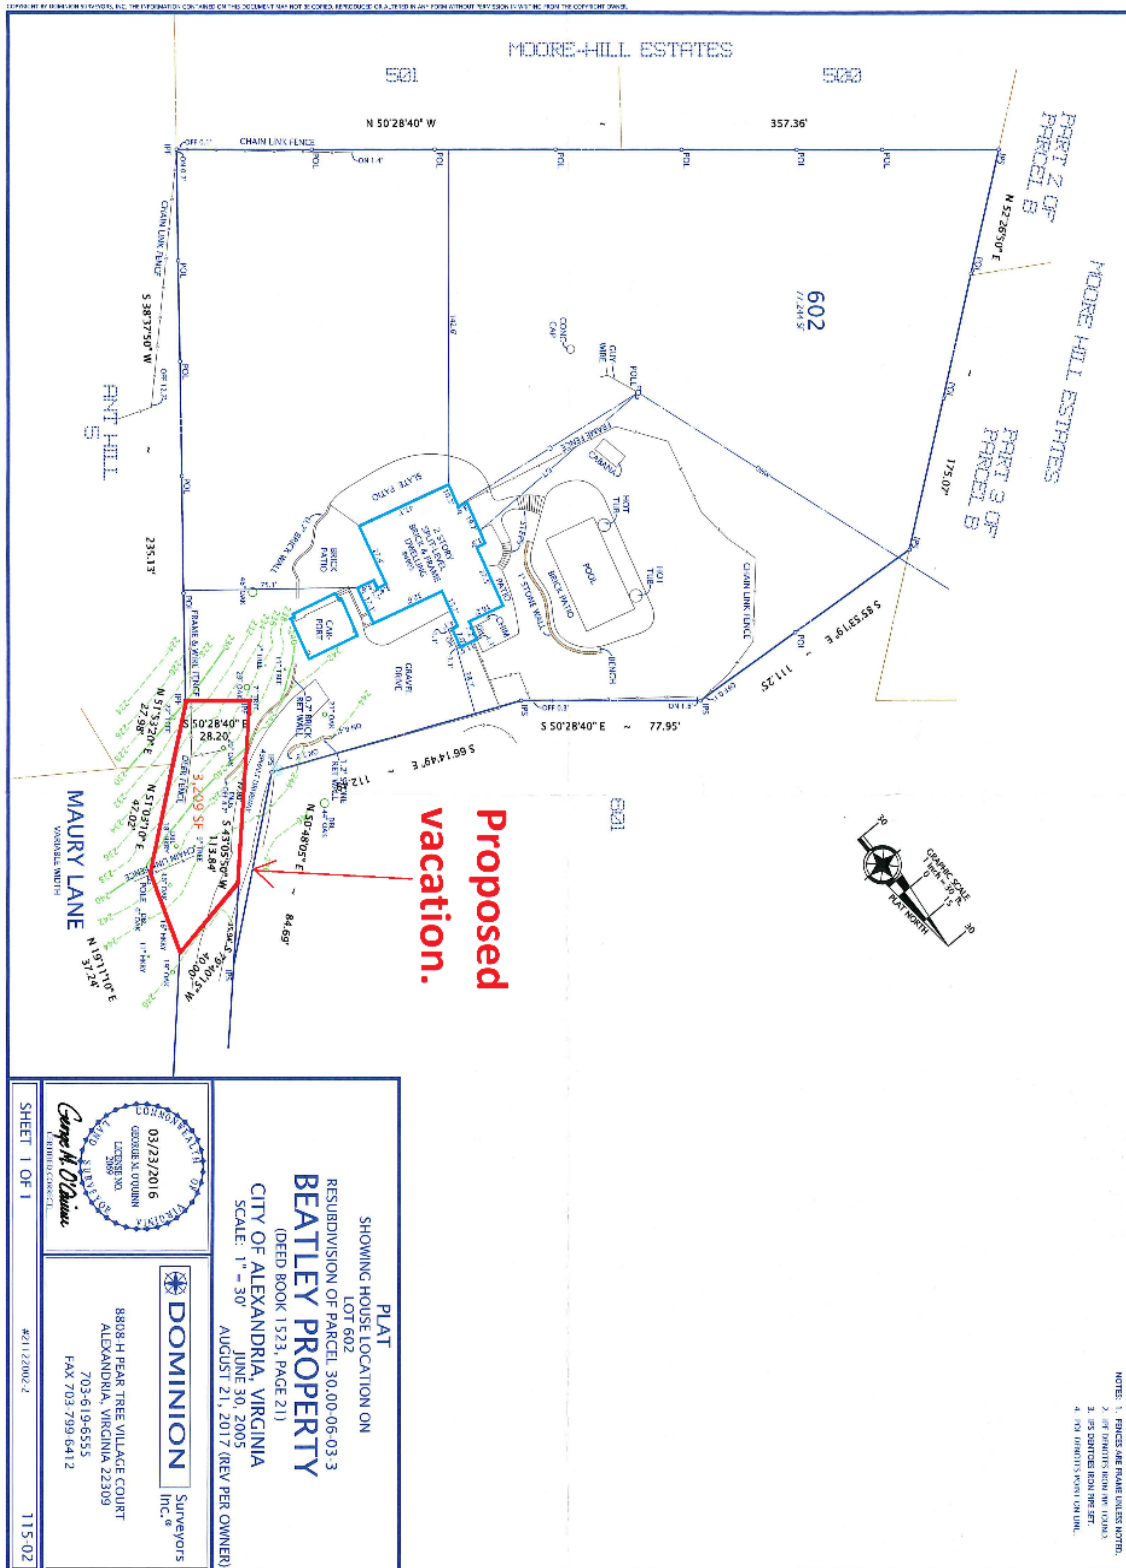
The plat showing the proposed vacation in red, and buildings in light blue.
